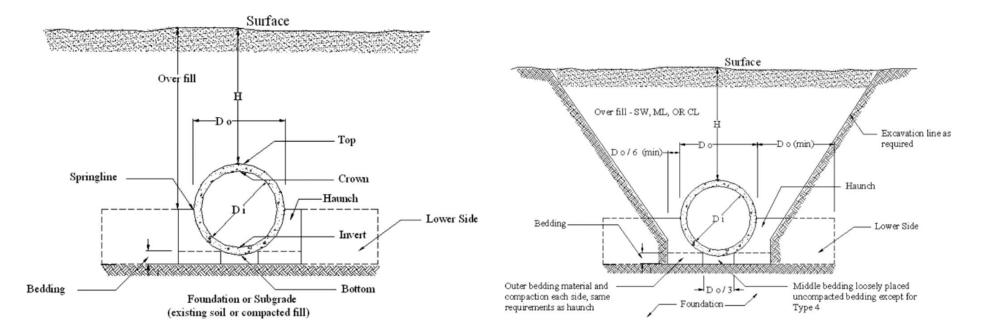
Typical installation details for concrete circular culverts for typical installation and for trench installation (from Erdogmus etal., 2010). Culverts come in a wide array for shapes and materials that result in unique considerations for proper installation, but all culverts should be installed with engineered bedding and overfill / backfill layers to prevent pipes from puncturing and to reduce the likelihood of piping failures caused from seepage during storm events.
